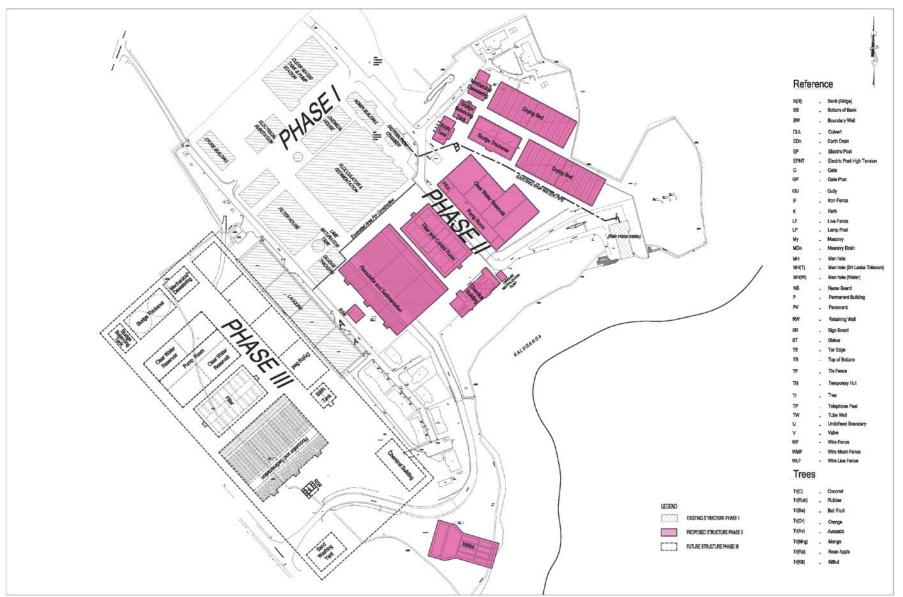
Proposed Layout of Process Facilities Source: JICA Survey Team
